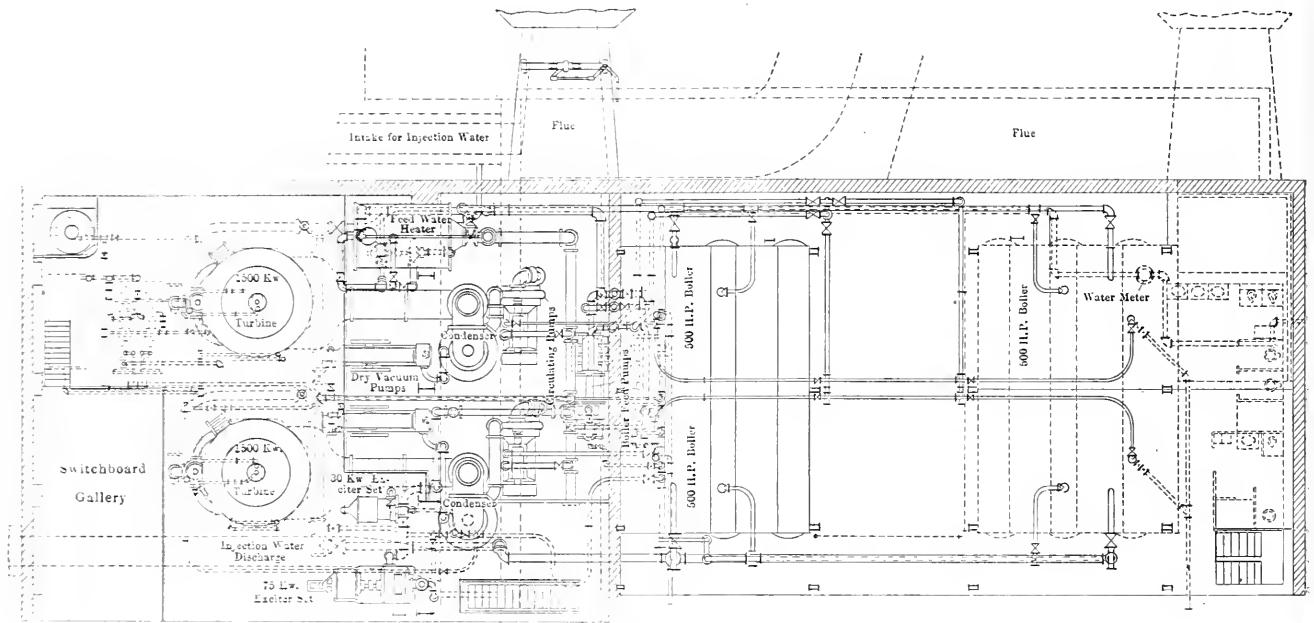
PLAN OF POWER PLANT AT EAST BRIDGEWATER
